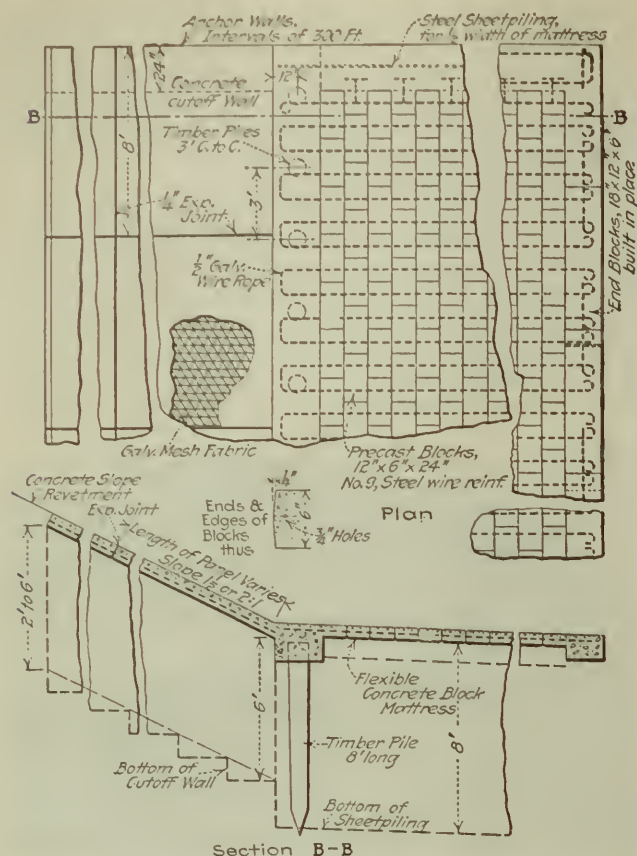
DETAILS OF LEVEE REVETMENT AND FLEXIBLE CONCRETE MAT
